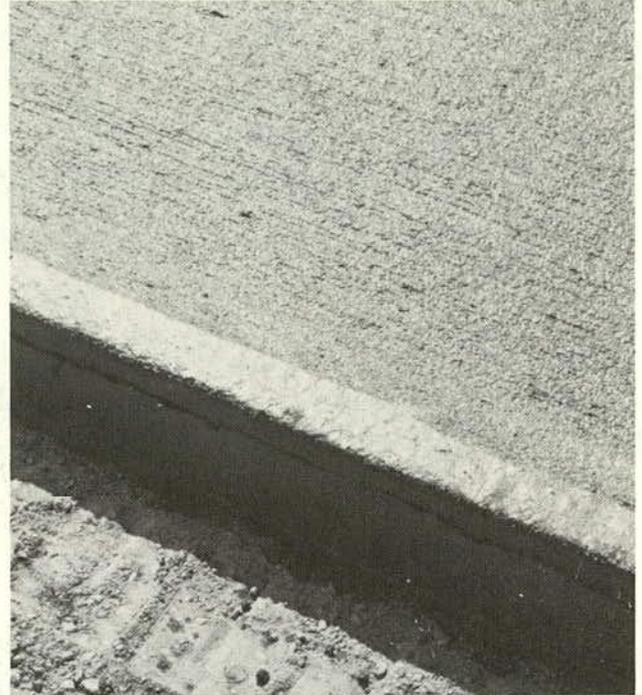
Detail of slip-form placed concrete edge and burlap drag texture.
